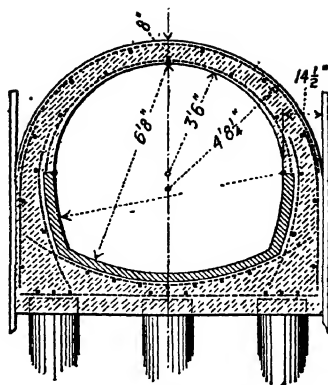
Louisville, Ky., Northwestern Sewer, Sec. B2, Contract No. 54, 1910, J. B. F. Breed, Chief Engineer. Horseshoe section, 9 by 9 ft. Excavation in clay and sand. Average cover about 13 ft.
